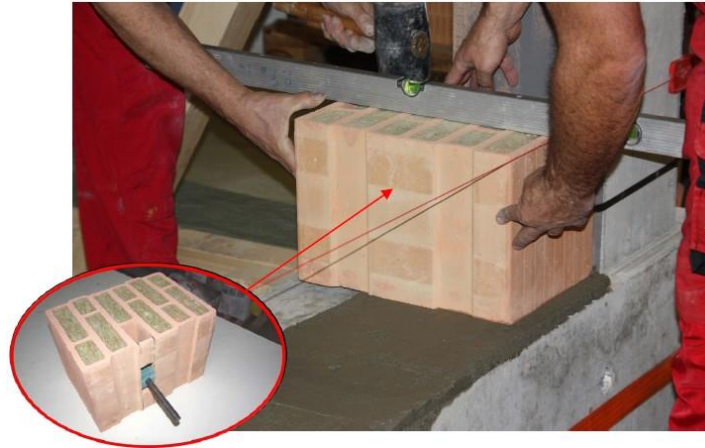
Placing mortar on bottom beam in order to have perfect levelling while placing first row of bricks
